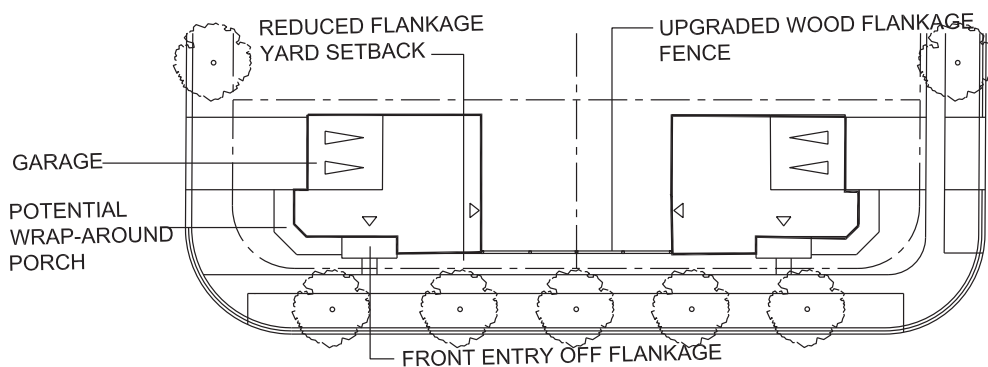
Conceptual Plan View of Dwellings Flanking the Spine Road (without Rear Extension)
